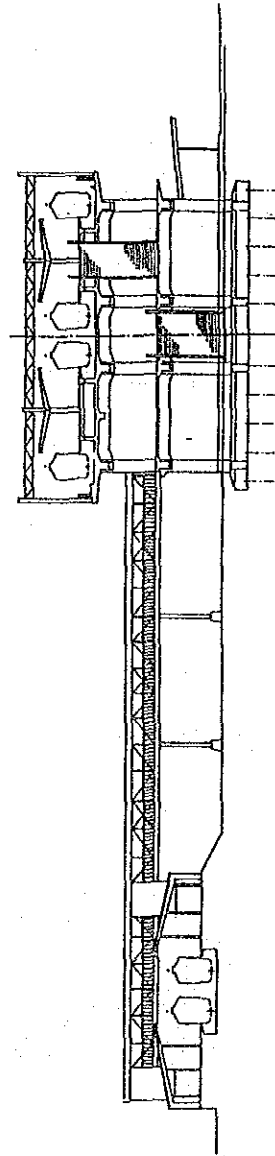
Plan of the New-Kanpur Station
